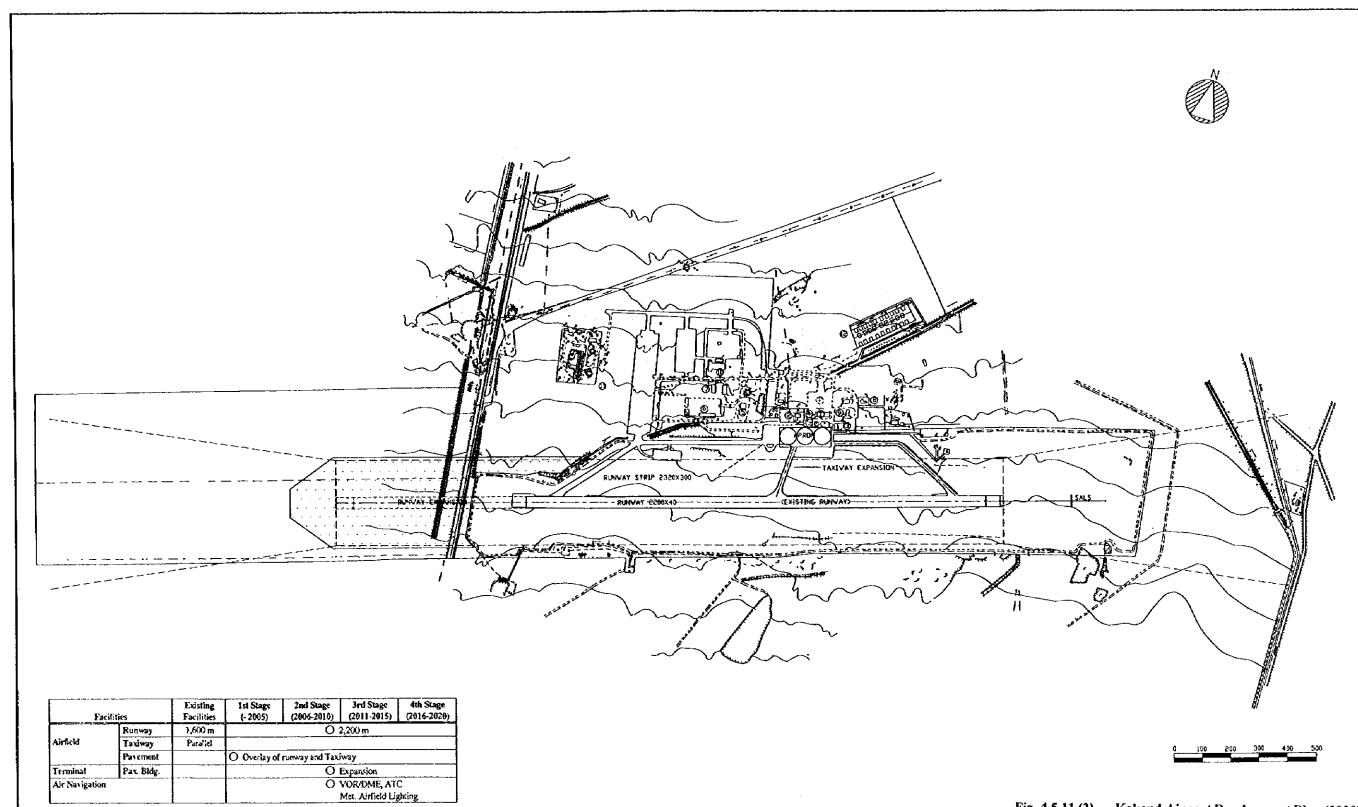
(2) Kokand Airport Development Plan (2020)
